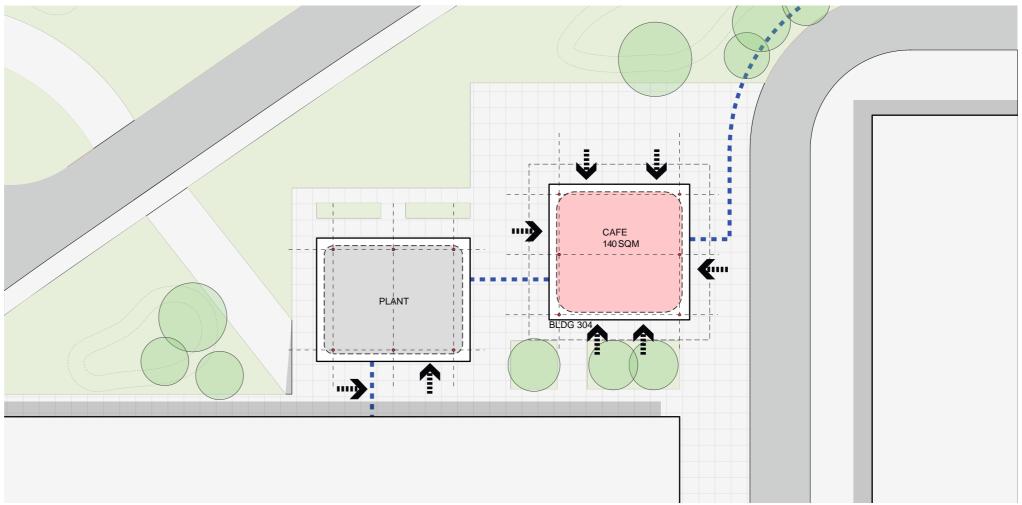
Ground Floor Plan of Cafe and Ancillary Pavilion
